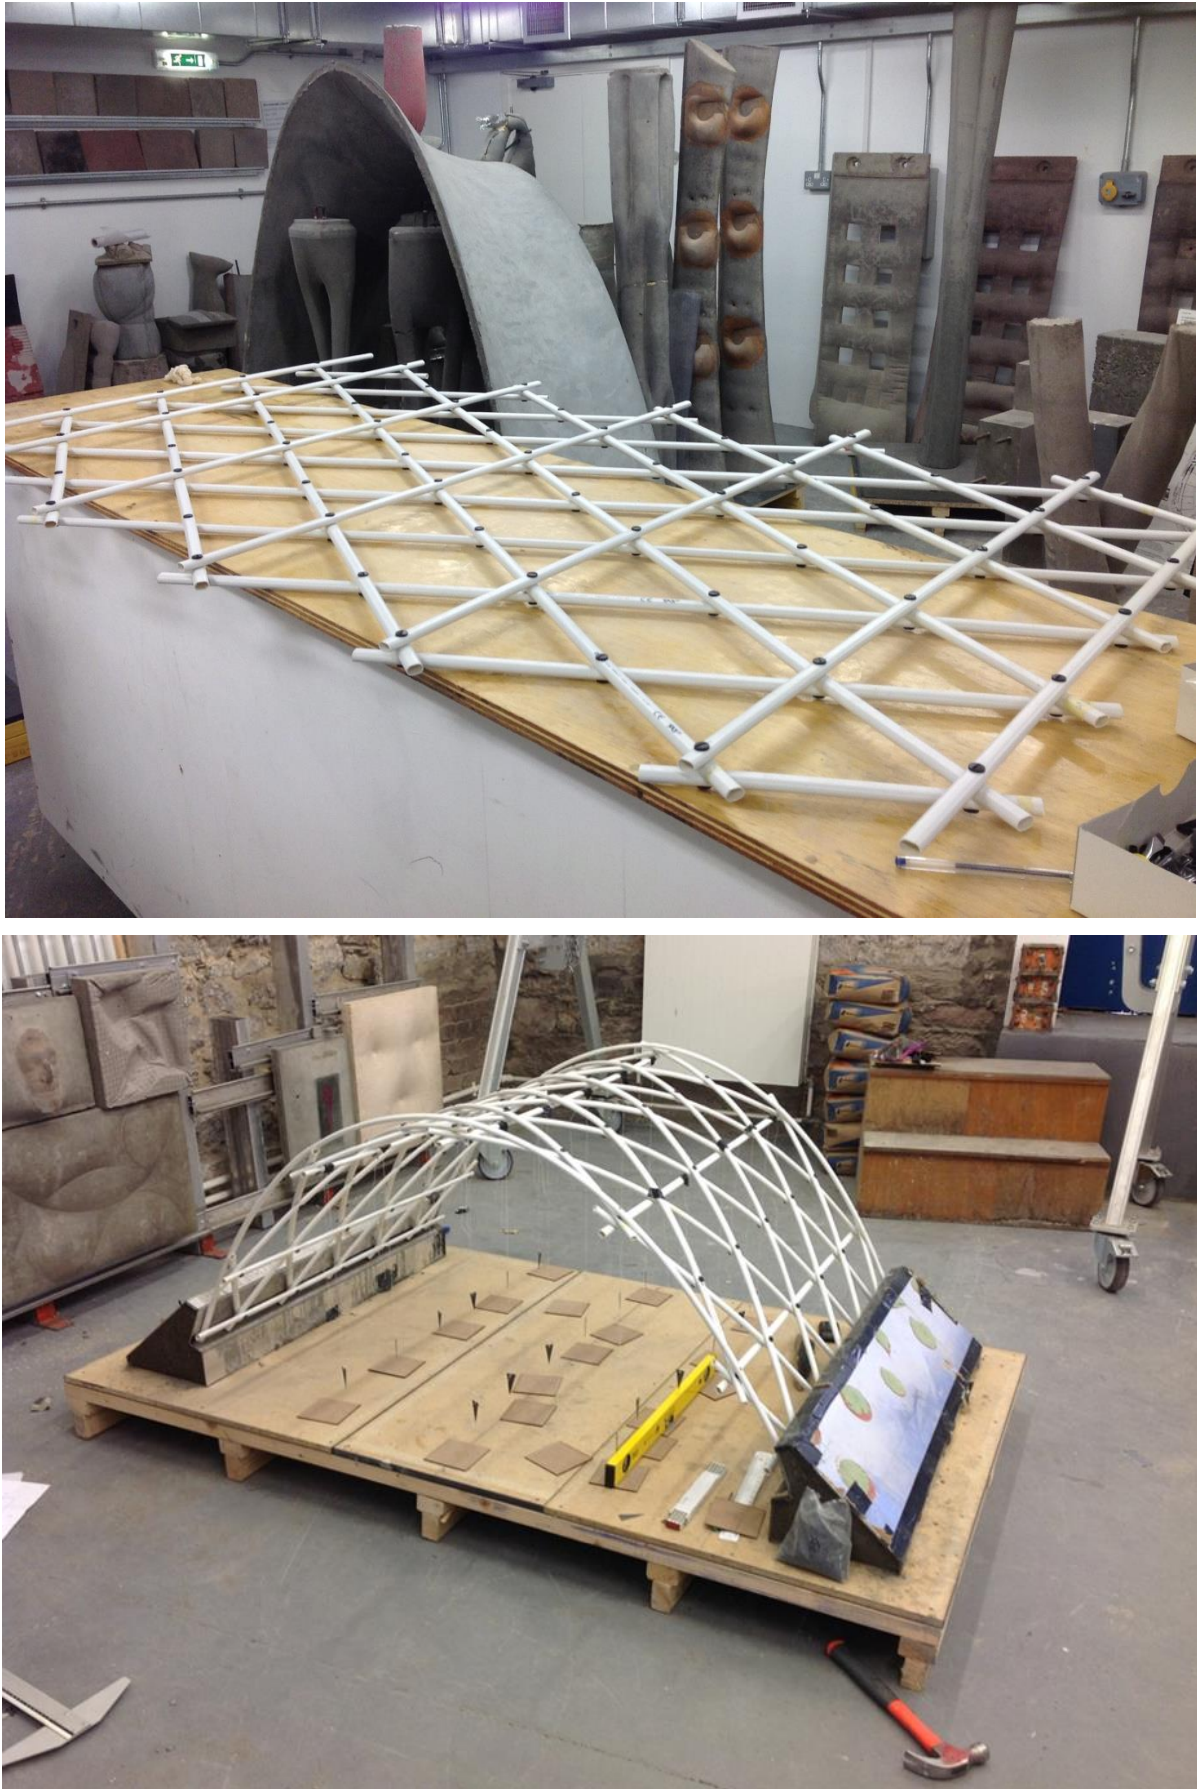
PVC gridshell propped against pre-cast concrete abutments.
